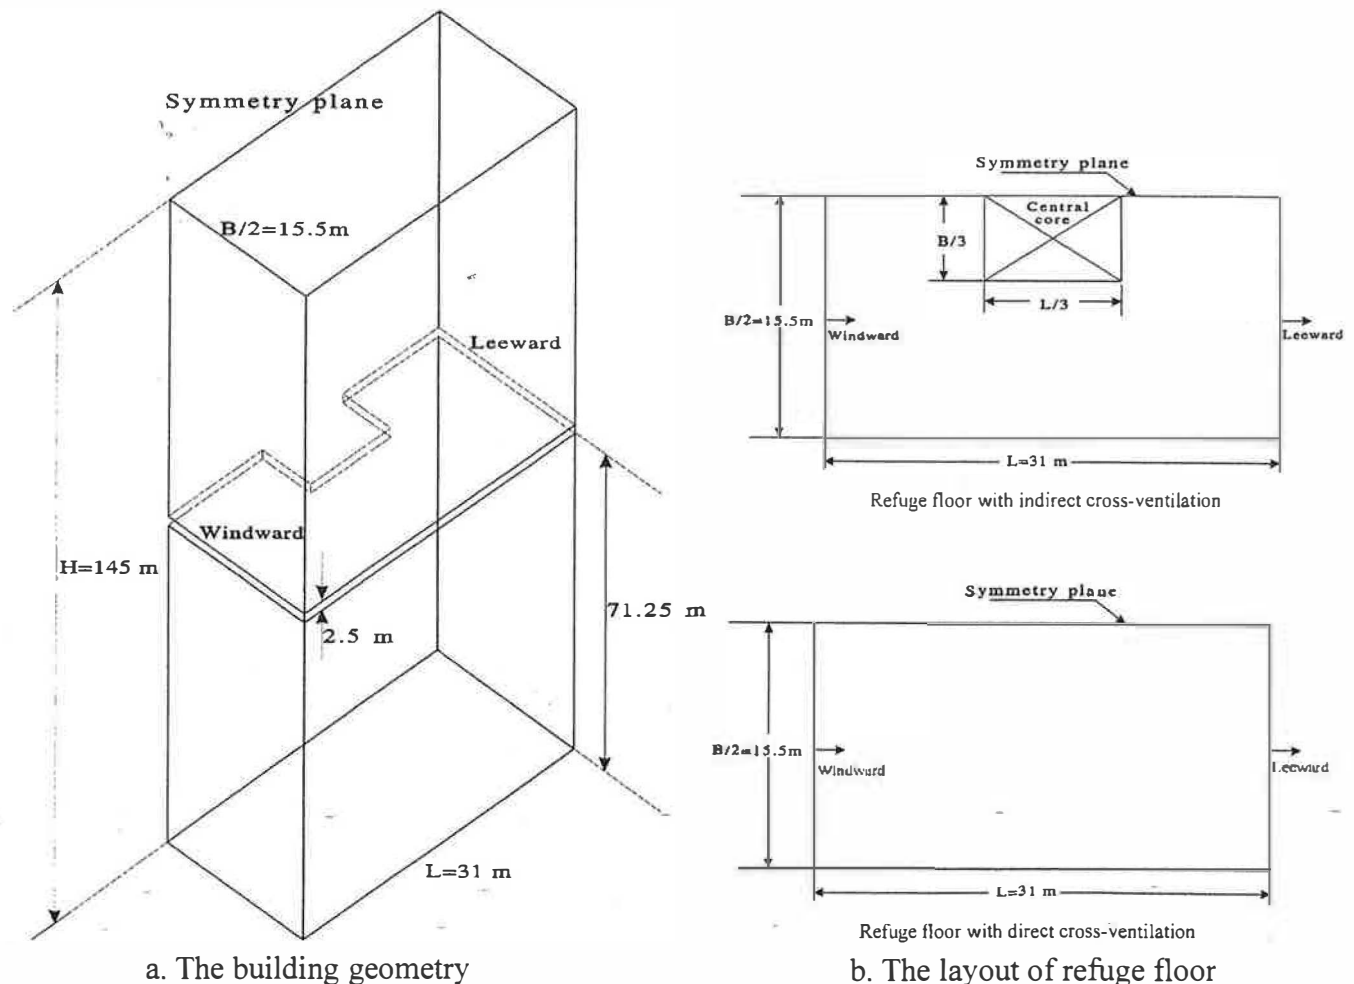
The outlines of model building. (a) The building geometry. (b) The layout of refuge floor.
